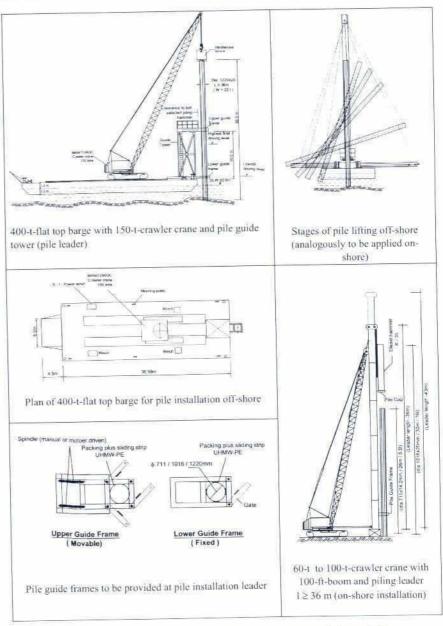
General installation method for large-diameter tubular steel piles
